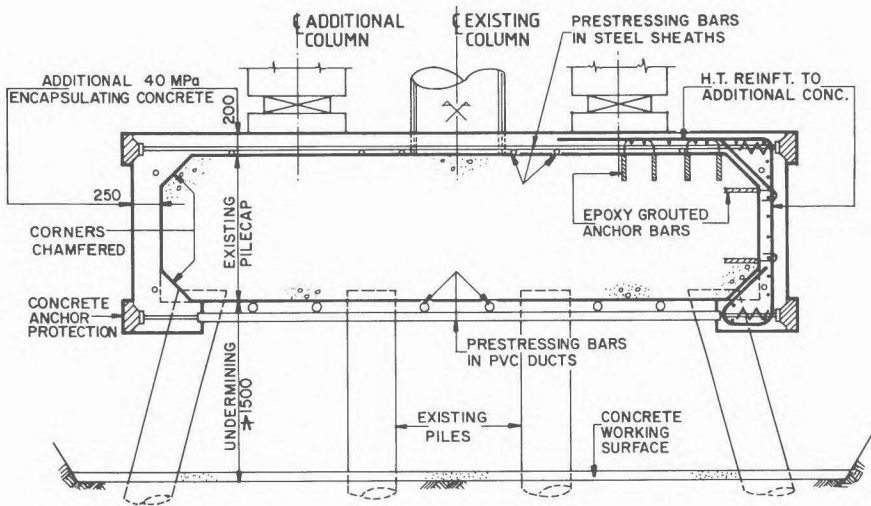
Typical Remedial Measures to a Column Pile Cap
